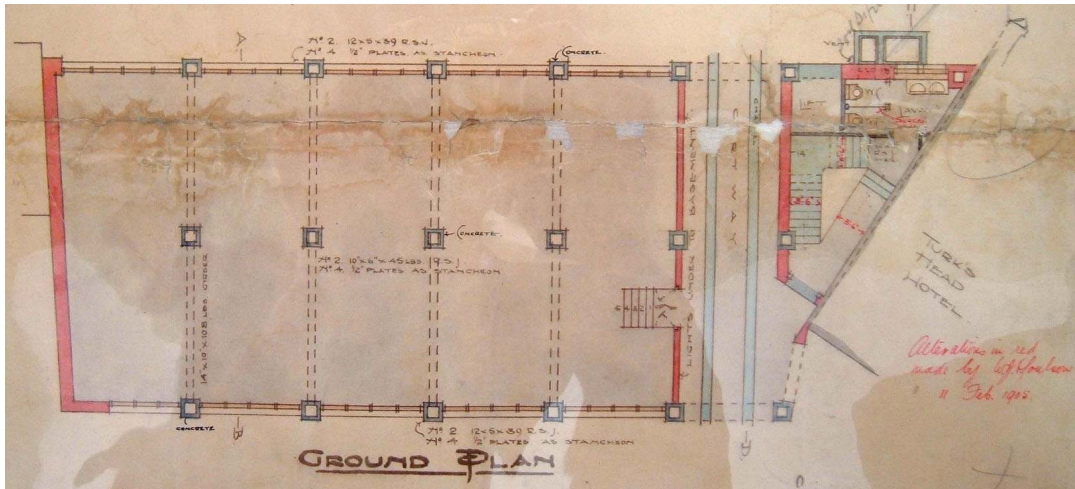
Warehouse Plan, 1905, by Cackett and Burns Dick.
